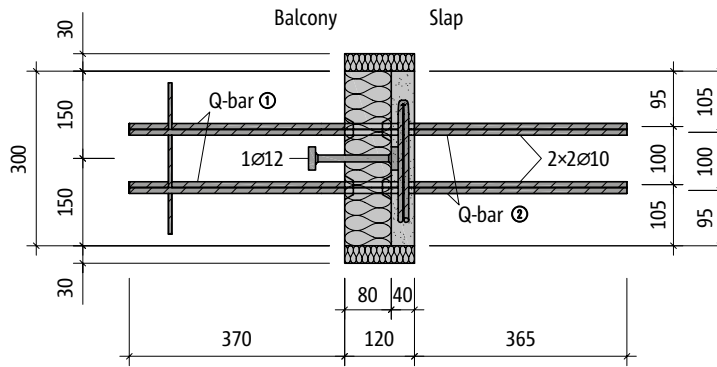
Plan view: Schöck Isokorb® type RQP10+RQP10
